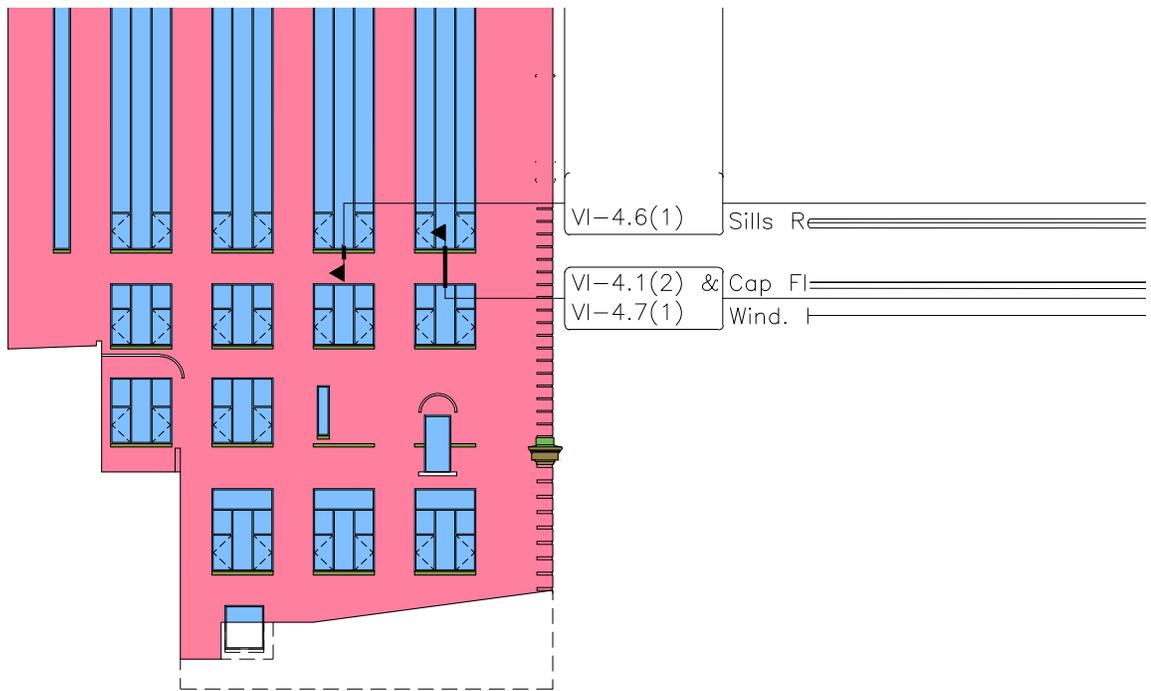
(6): North Courtyard: East-Facing Wall
